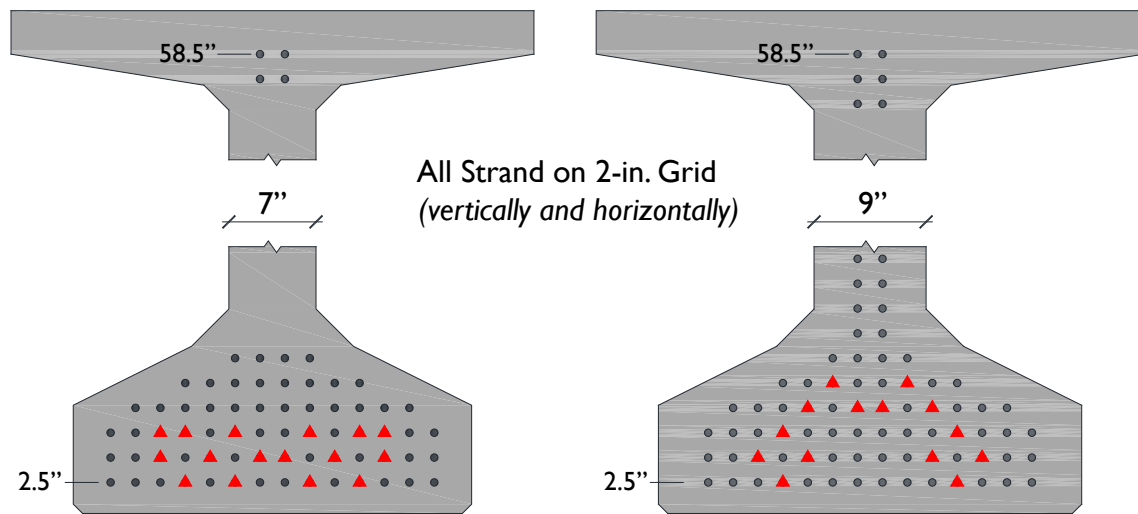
Tx62 Test Specimens Showing Dimensions of 7 and 9-inch-thick Web Girders
